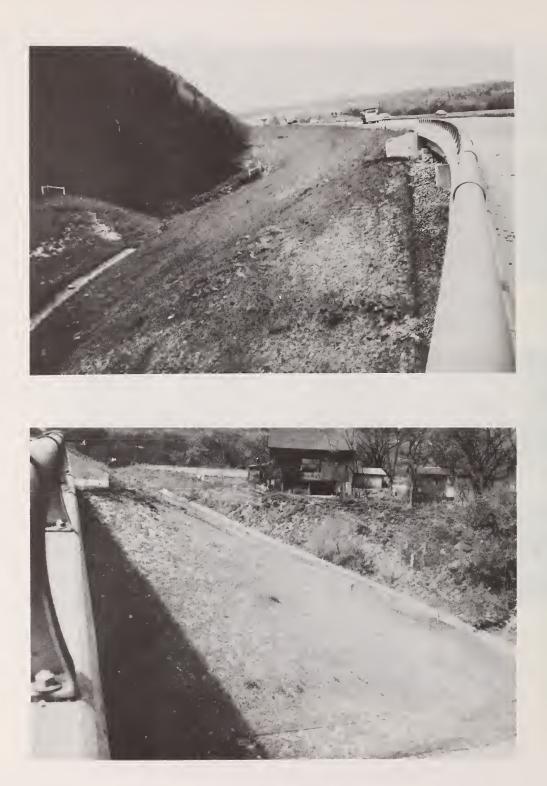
West approach embankment I-74, Ohio at Wesselman Road
